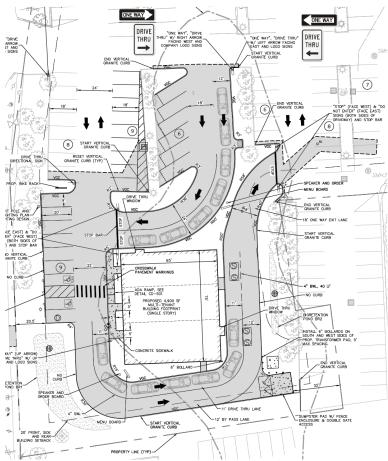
An excerpt of Sheet CS1-02, Site Layout Plan of the application, which shows the flow of vehicles into and out of the proposed drive-through lanes on the site.
